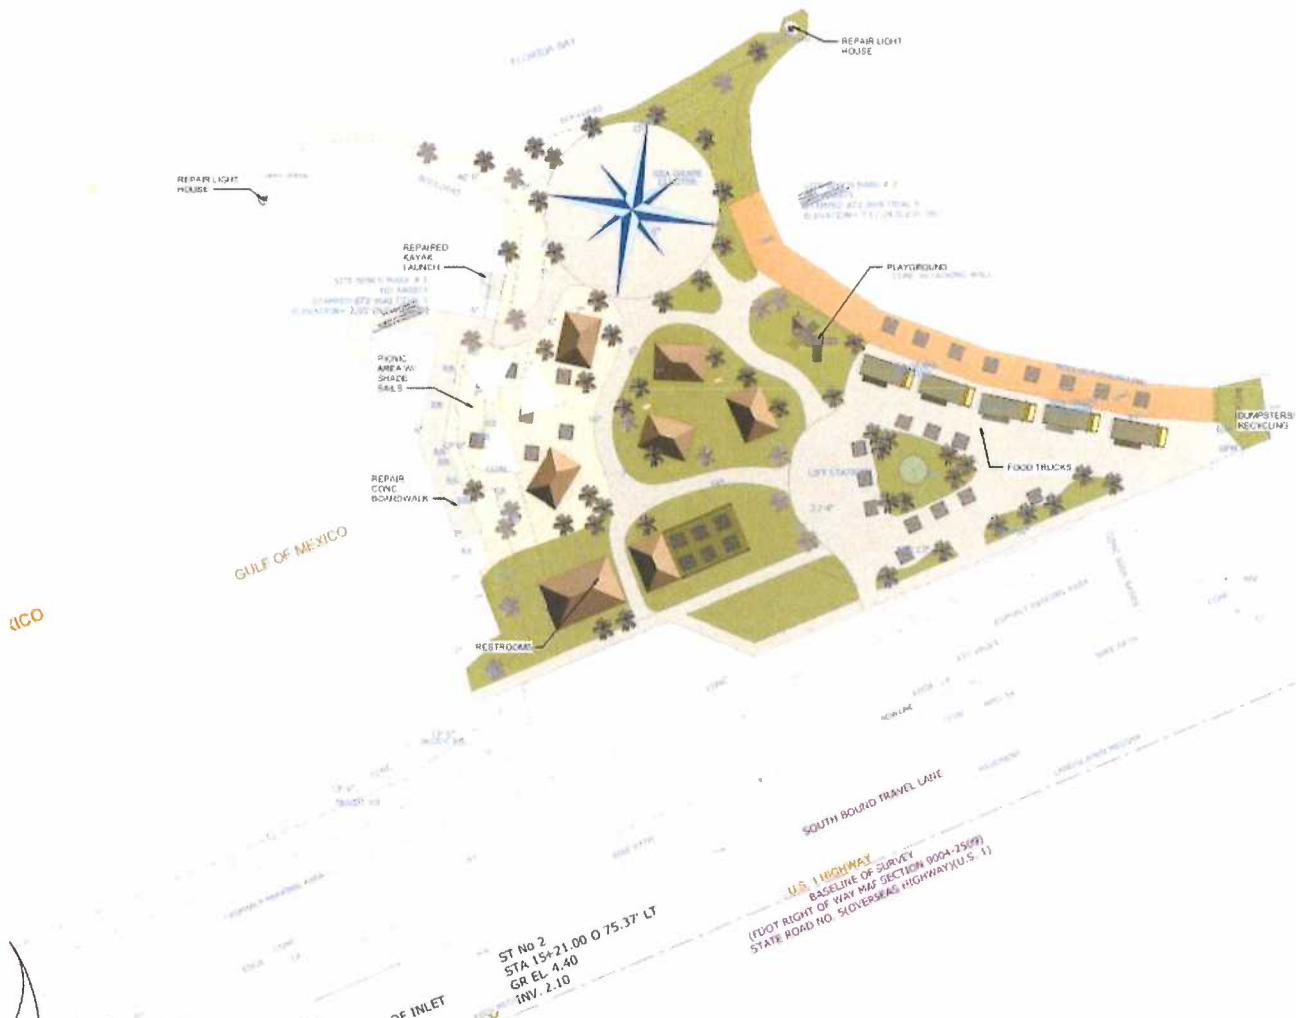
PRELIMINARY PLAN PROVIDED BY THE CITY
